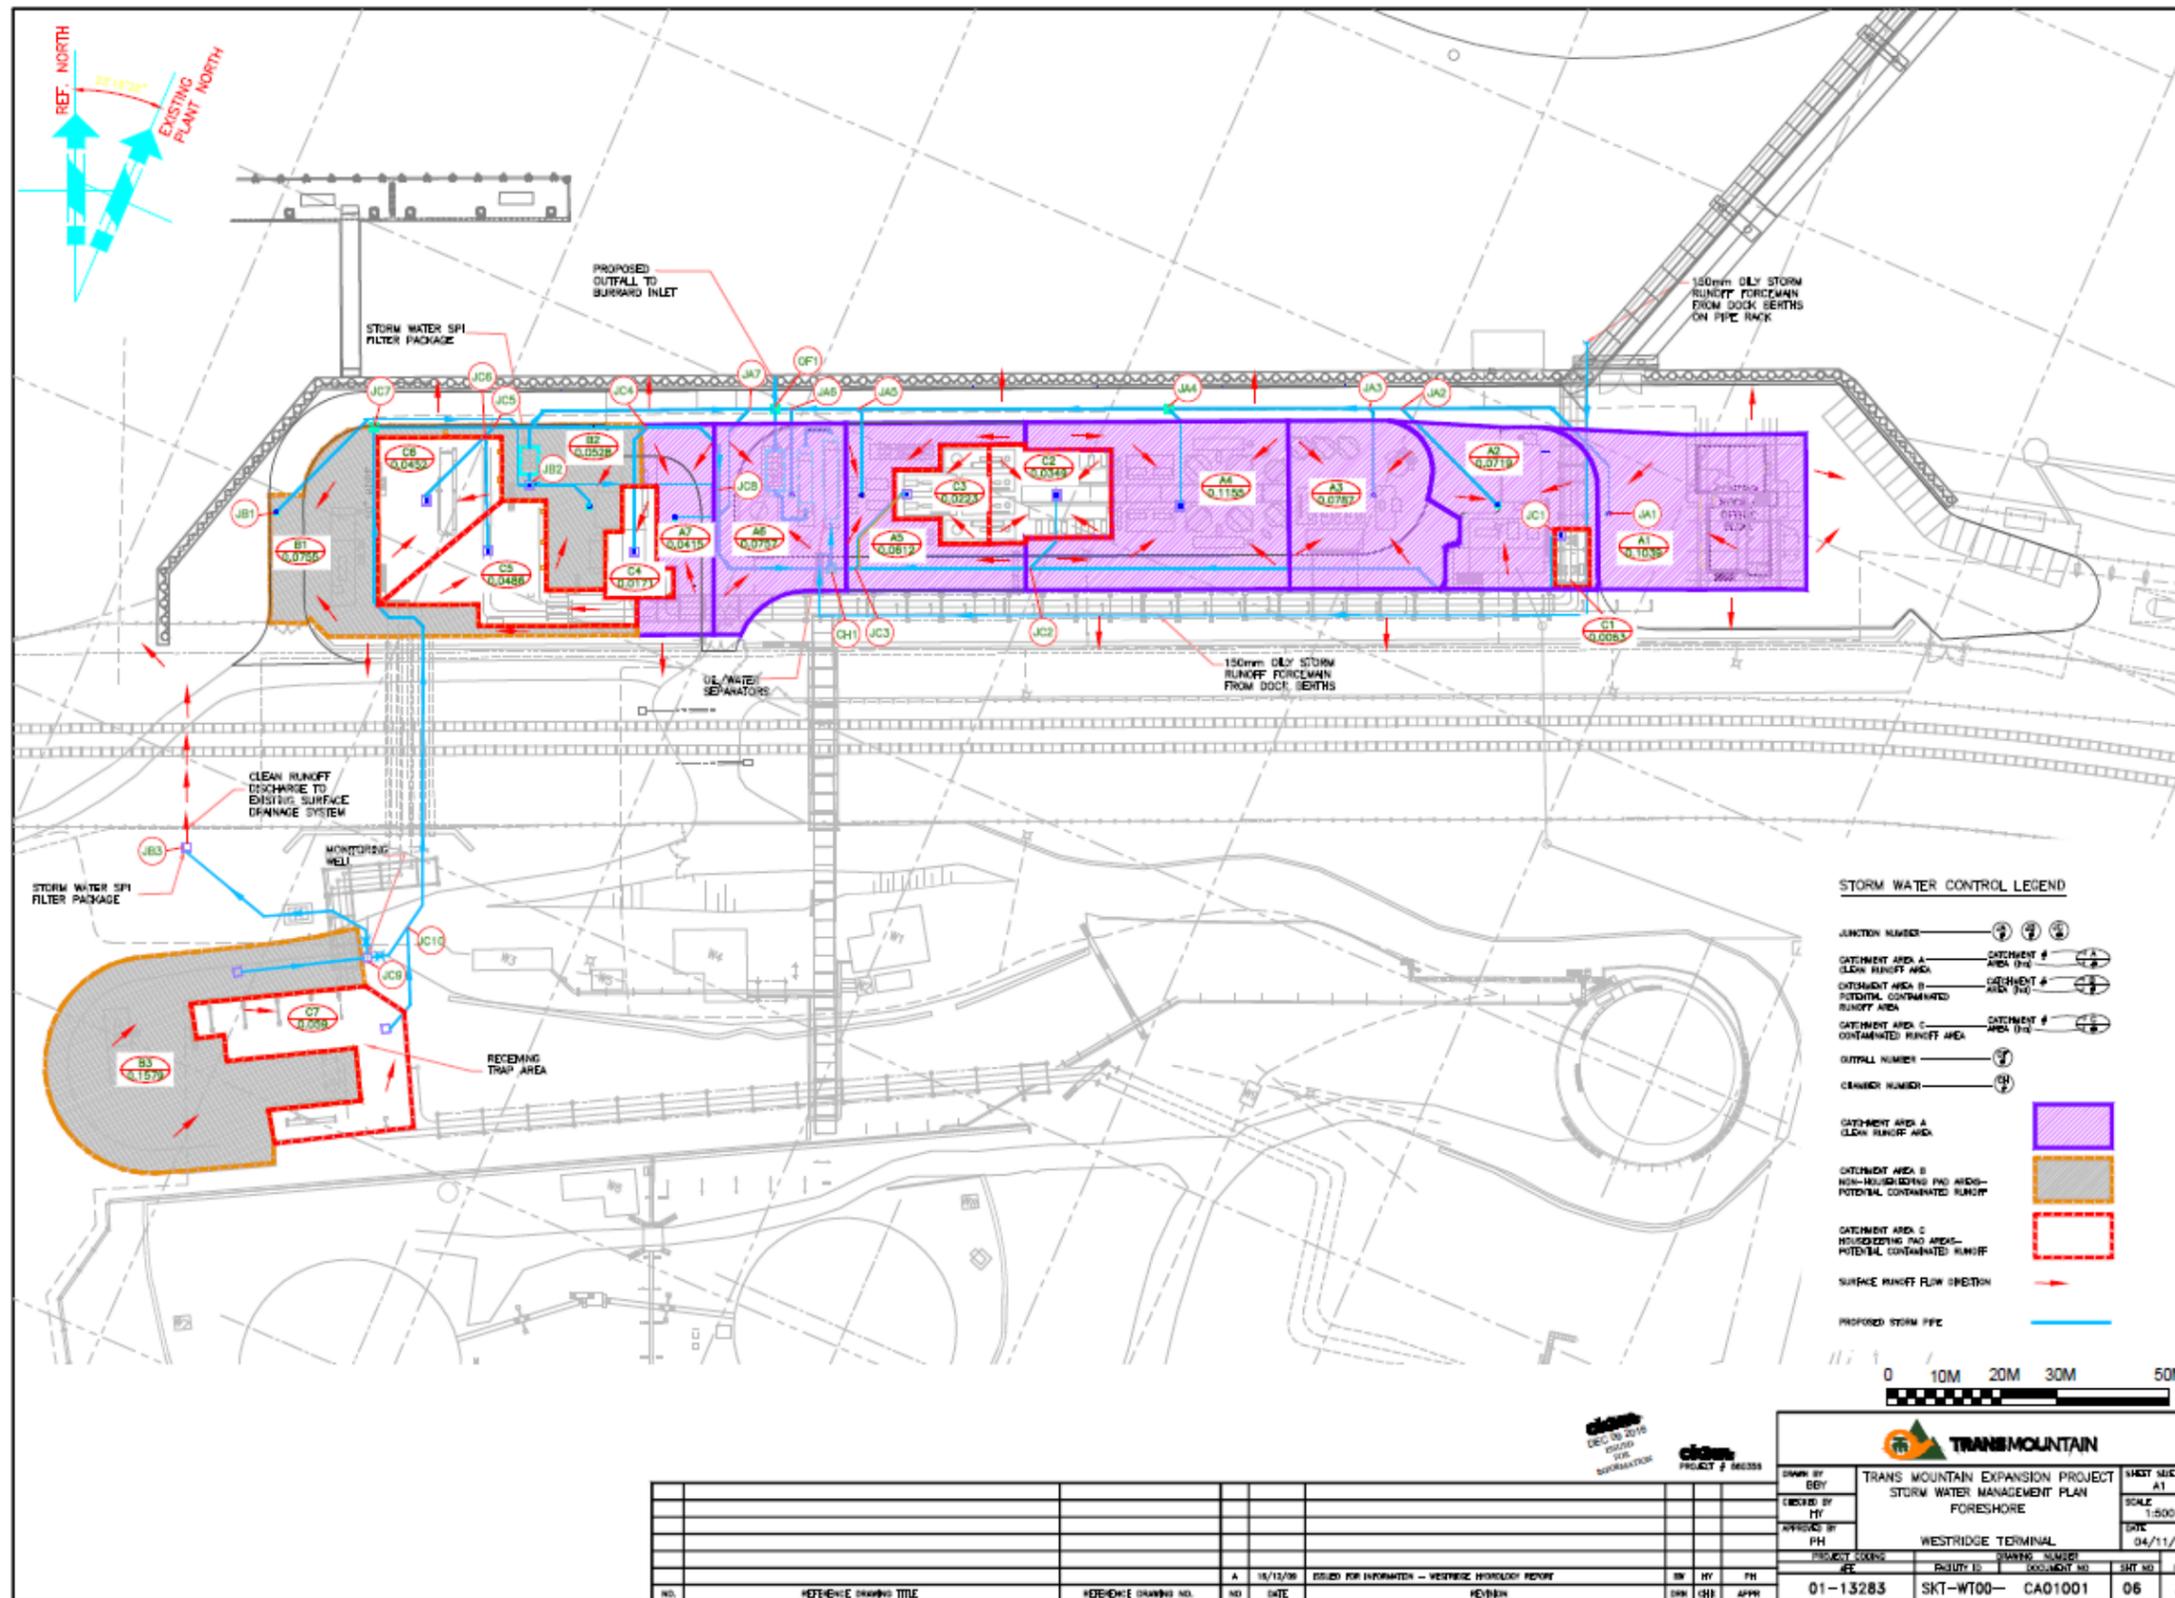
Westridge Marine Terminal – Stormwater Management Plan - Foreshore
